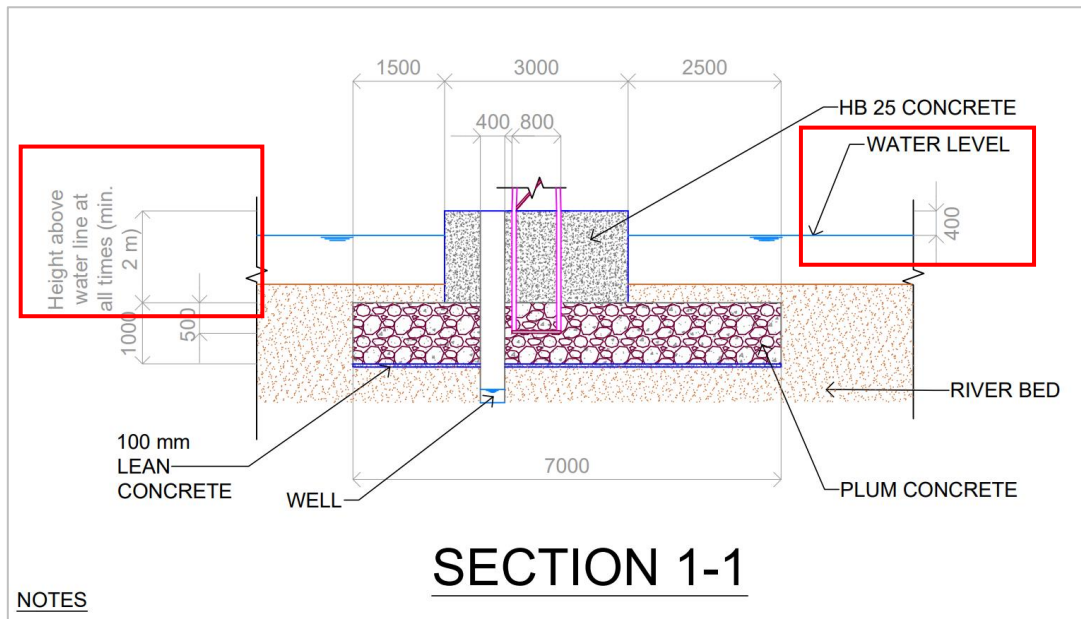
Tower platform elevated above flood water level (Source: *Protection structure for wells in wadis*)
